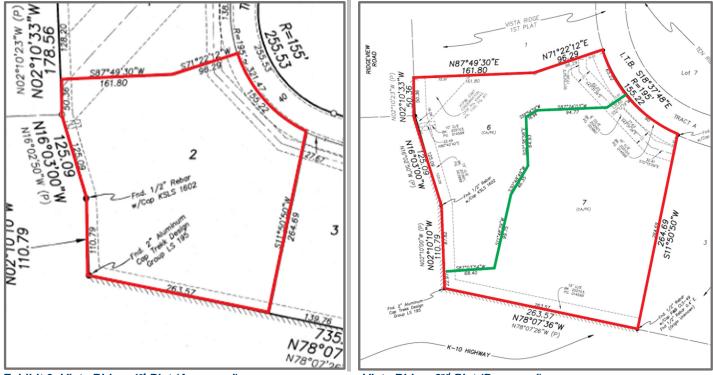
Vista Ridge, 1st Plat (Approved)
